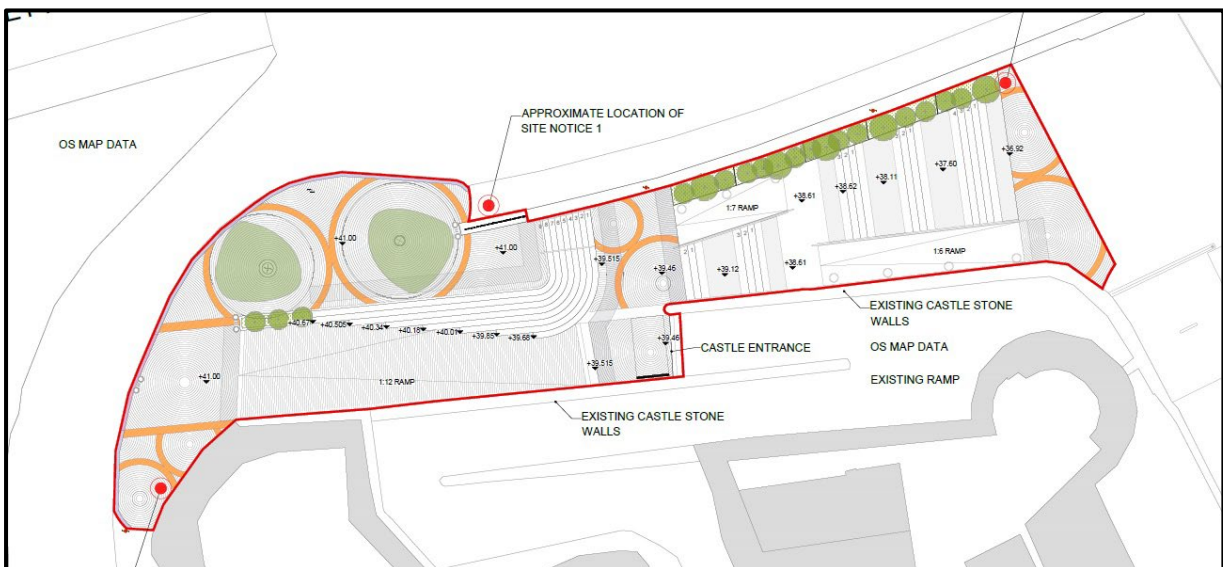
Proposed Castle Public Realm Plan (Source: Urban Agency)
